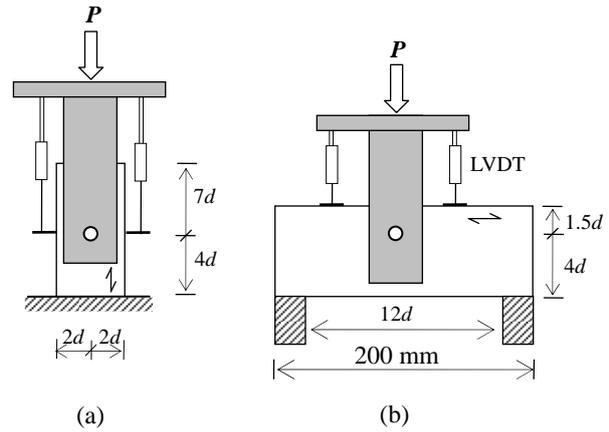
Single bolt connection test setup: (a) loading parallel to the wood grain; and (b) loading perpendicular to the wood grain. d is bolt diameter
